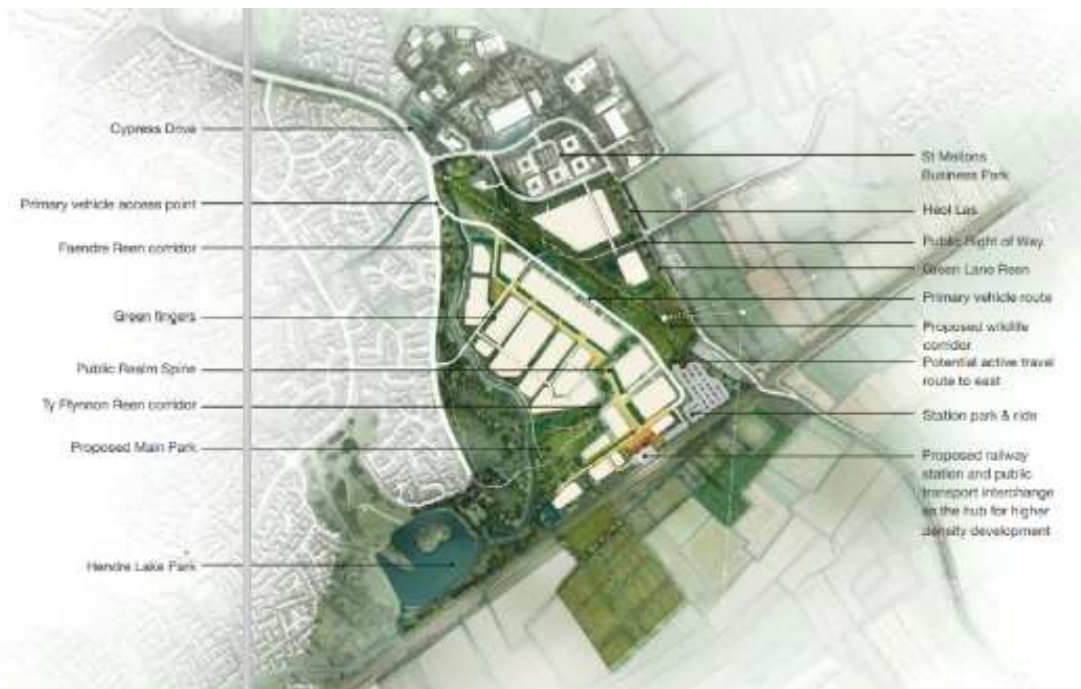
Land South of St Mellons Business Park – Indicative Site Layout
